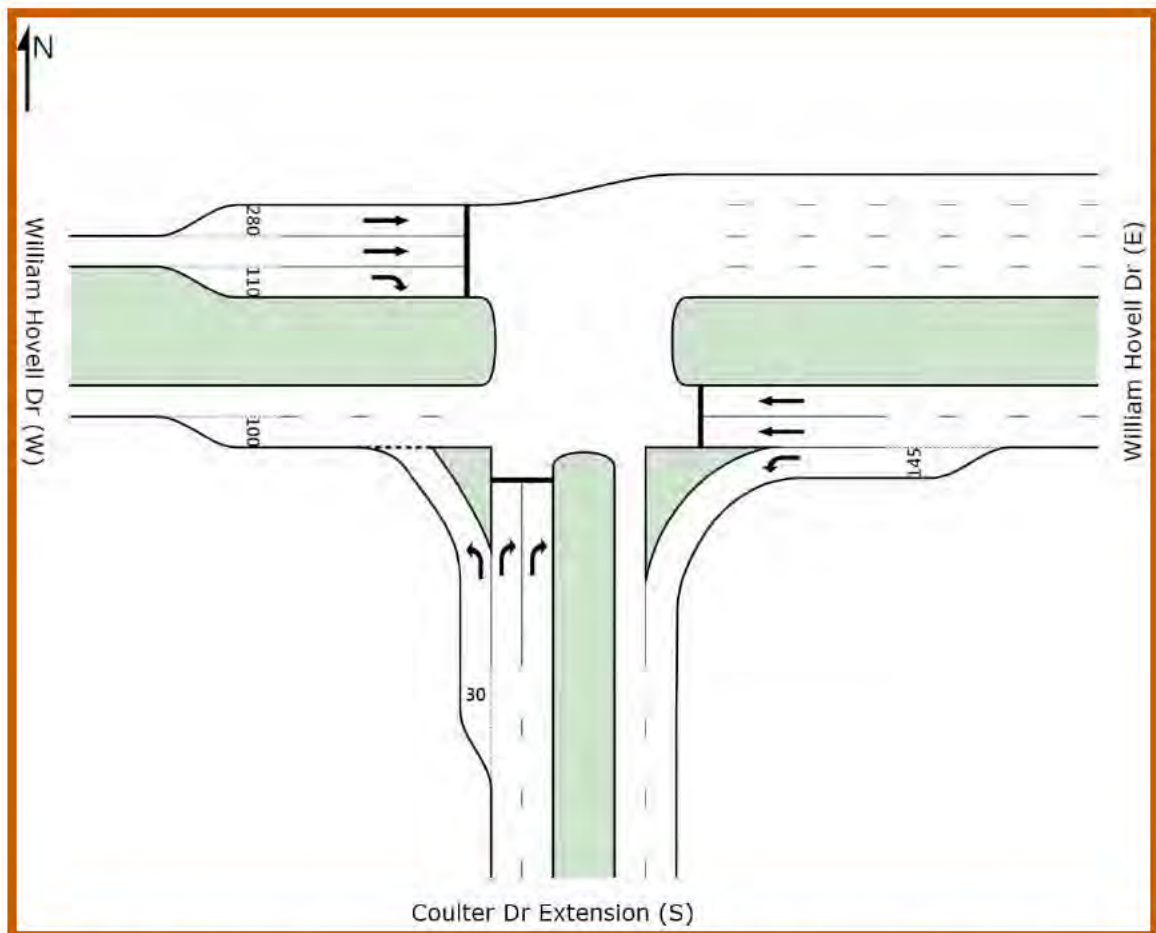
Intersection Layout of William Hovell Drive – Coulter Drive Extension (Staggered T 2031)
